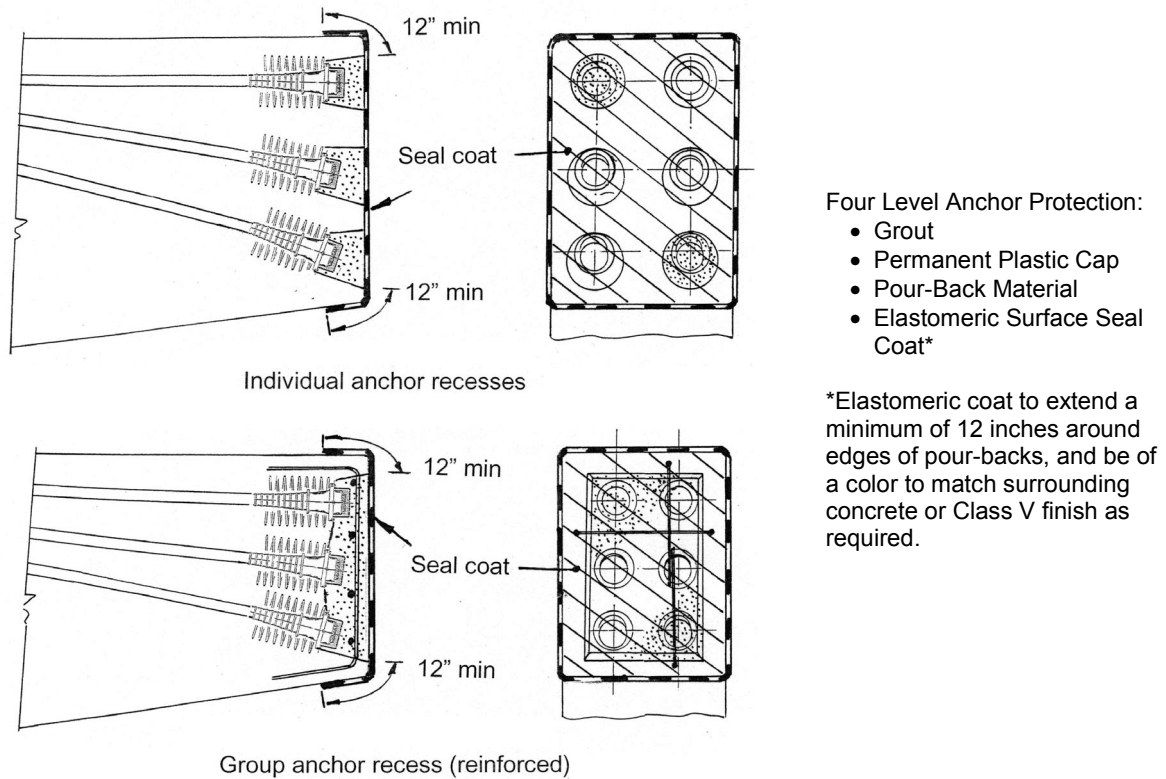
Anchor Protection for Exposed Surfaces (End of Pier Caps or Hammerhead Caps)
